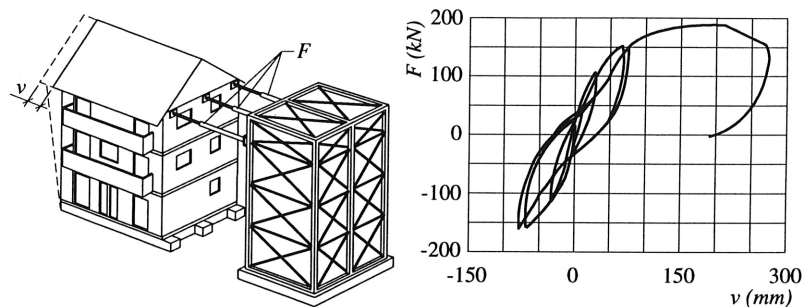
Ductile behaviour of a plywood sheathed timber house.
